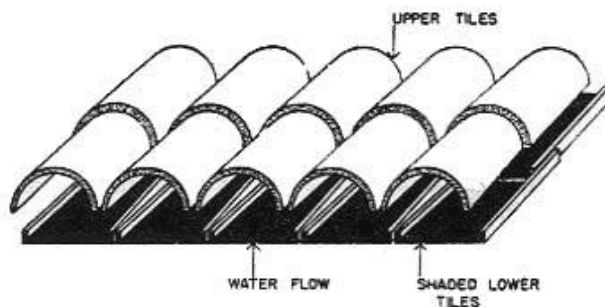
Double layer of roofing tiles with water flow and shading layer shading the lower layer. A perforated pipe would be installed at the ridge so that water could flow over the lower layer of tiles and keep the building cool. Again, shading would reduce both heat gain and water loss. Such a system would be more difficult to maintain than the simple flat roofs but it was felt that it would be possible for the owners to operate and maintain it over limited roof areas.
